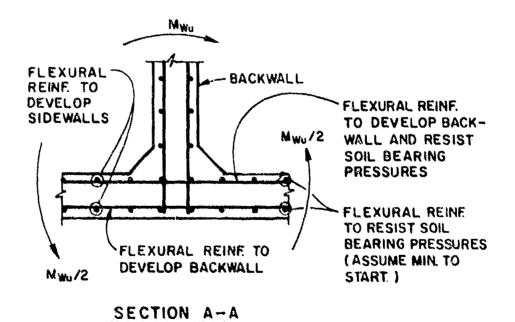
Single cell barrier with buttress walls - Moment balance at junction of backwall and foundation slab.
